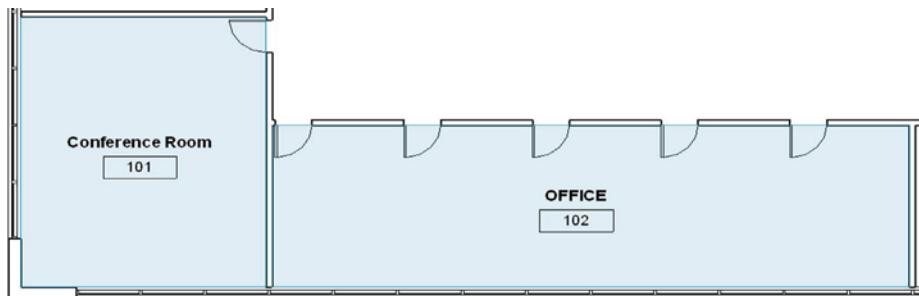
Zone-based modeling – floor plan. (Source: IES/Revit 2010).
